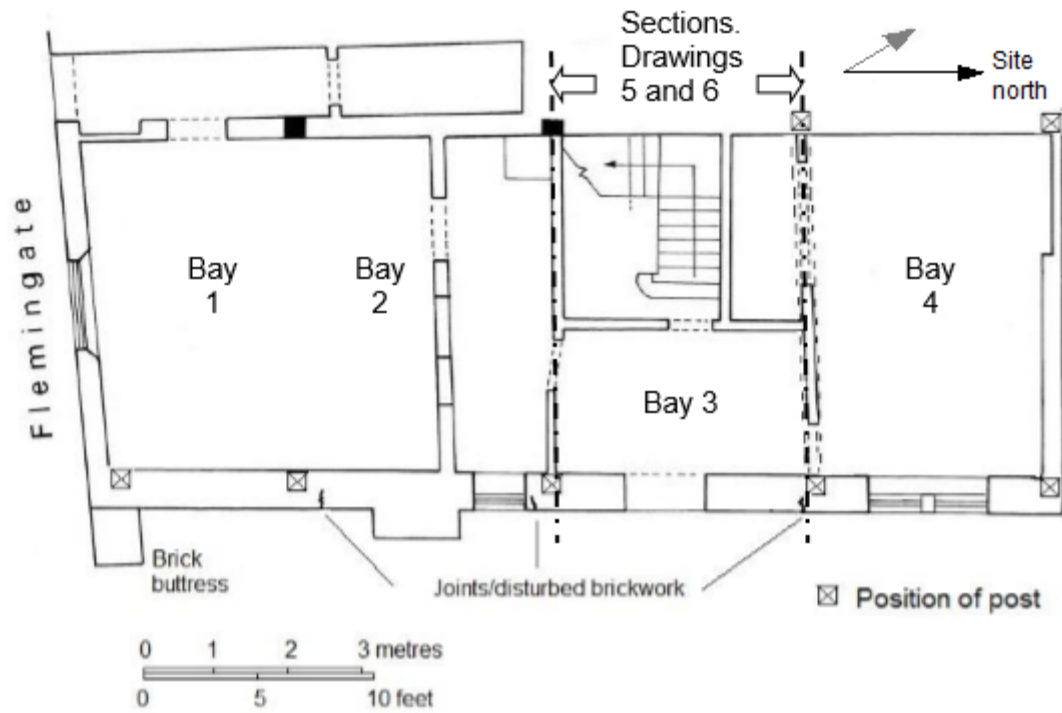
Ground-floor plan of 15 Flemingate (YVBSG 2015)
